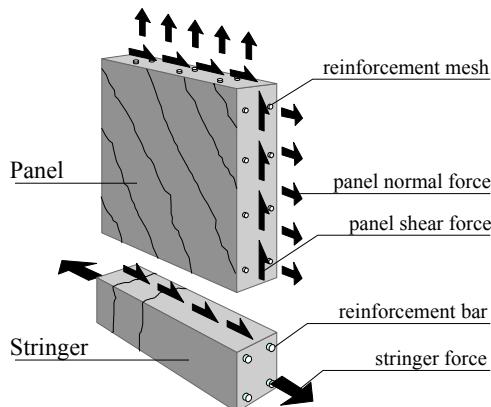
Stringers and panels are the building blocks of a concrete wall model.
